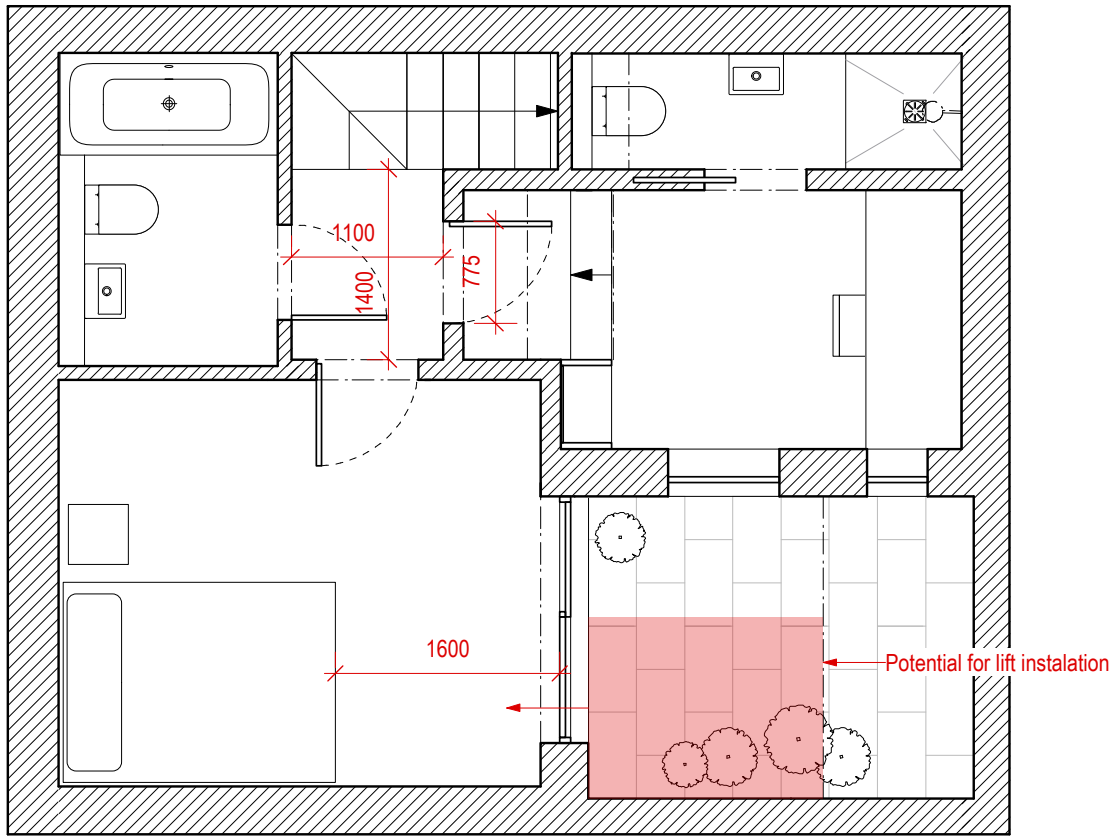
Lower Ground Floor Plan, scale 1:50.
